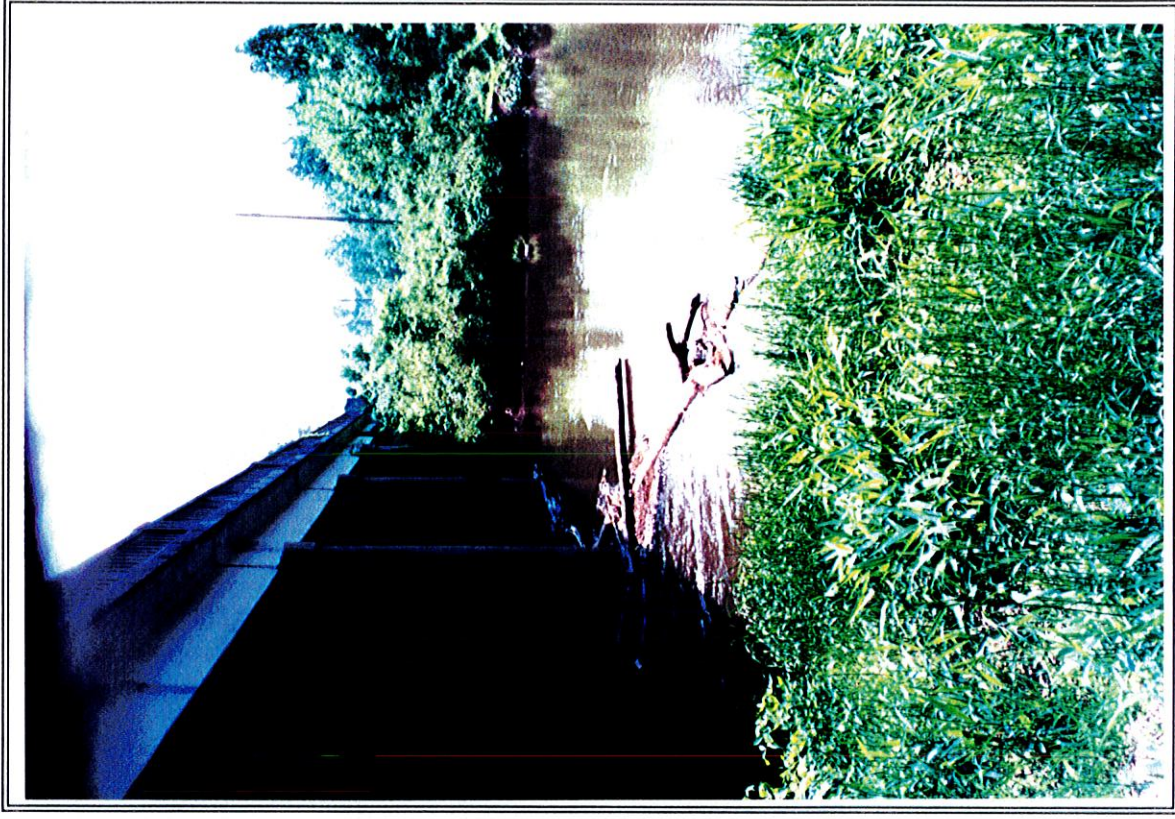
View of the west side of the bridge, looking south showing locations of the water borings SBLB1-A and SBLB2-A. The log jam shown in the picture has been removed to access Boring SBLB2-A
